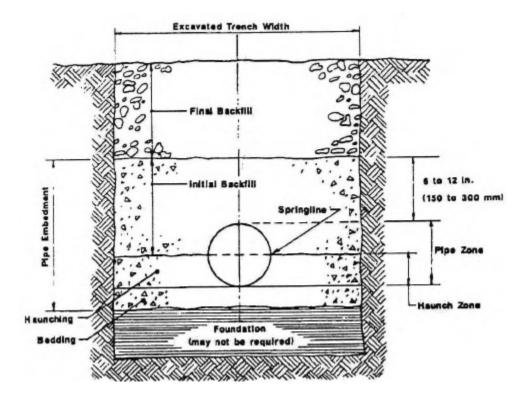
Pipeline Cross Section with Common Terminology (ASTM D2321)
